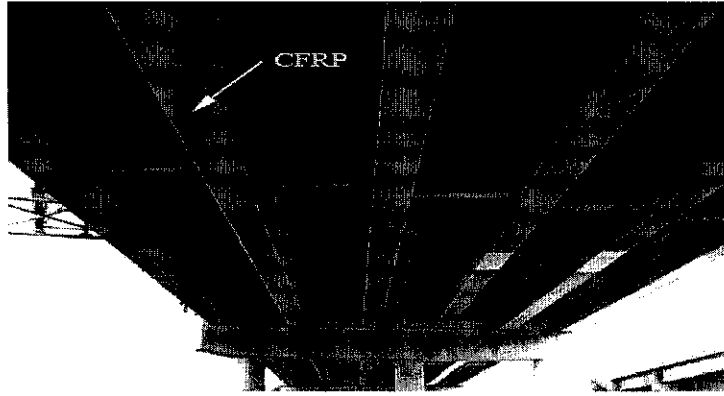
Photograph of CFRP on Beam 2 Altoona Bridge
